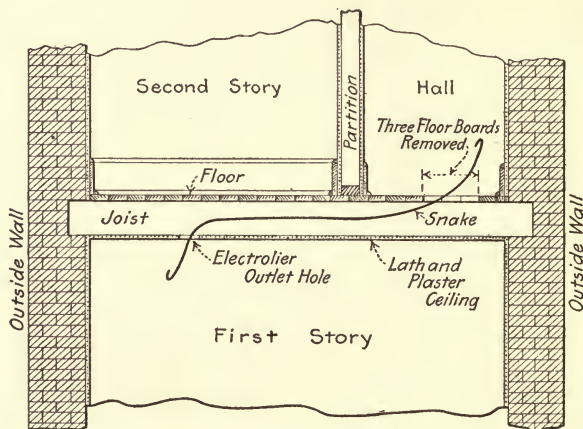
Fishing from a ceiling or center outlet to a pocket.
